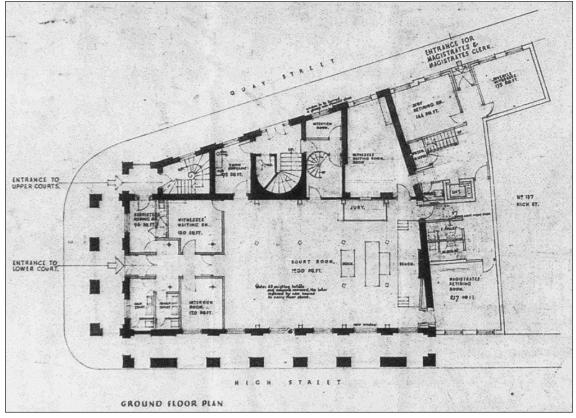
Ground floor plan of December 1966 by F. H. Booth, the county architect. [Isle of Wight Council, planning file TCP/5817/A]
